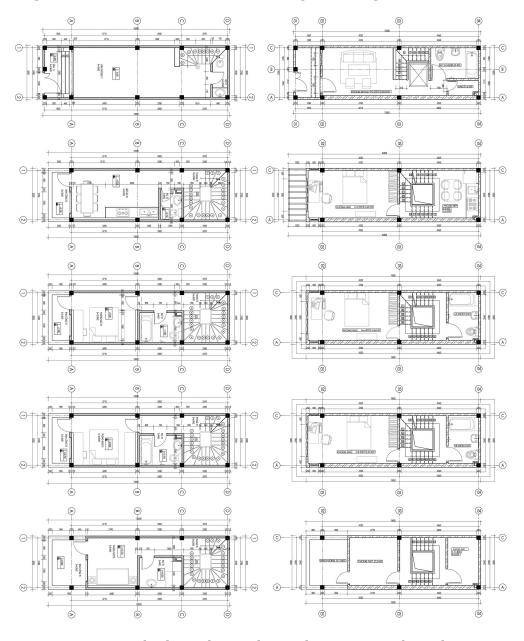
Two initial plans drawn by architects regarding descriptions of household about living spaces (Collected by author from local architect Thi)
